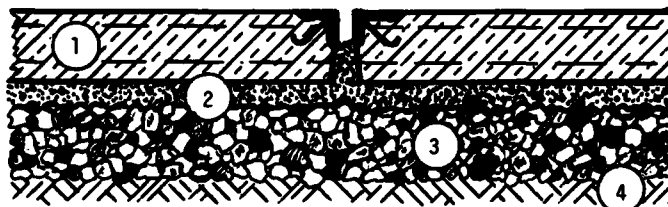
CONCRETE SLAB INSTALLATION CROSS SECTION
